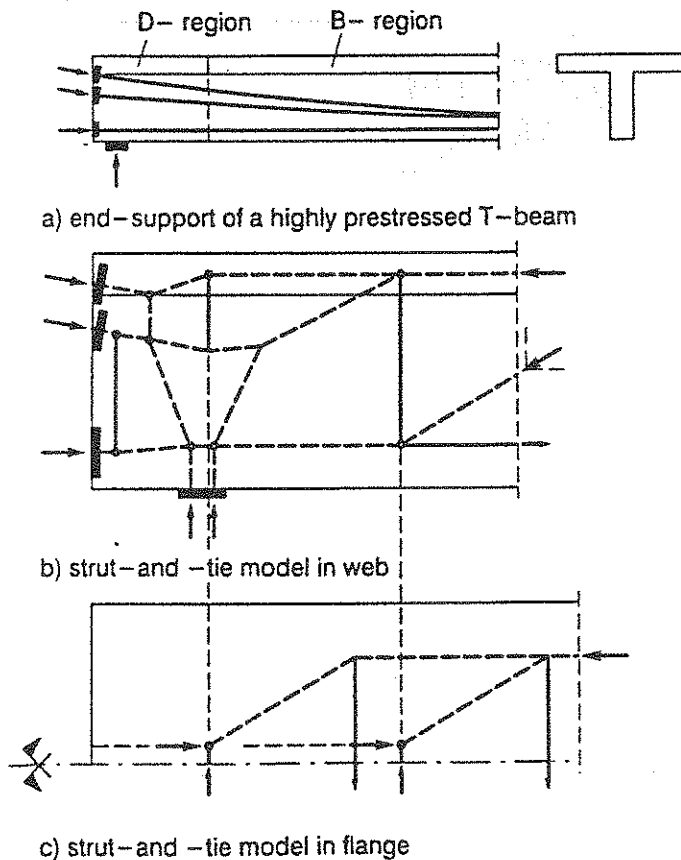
Strut-and-tie model for an end-support for a T-beam with prestressing anchors
